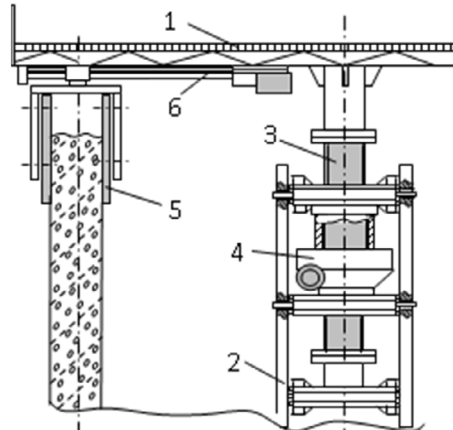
Slip form: 1 - movable platform; 2 - column; 3 - lifting post; 4 - electromechanical jack; 5 - form; 6 - radial displacement mechanism.
